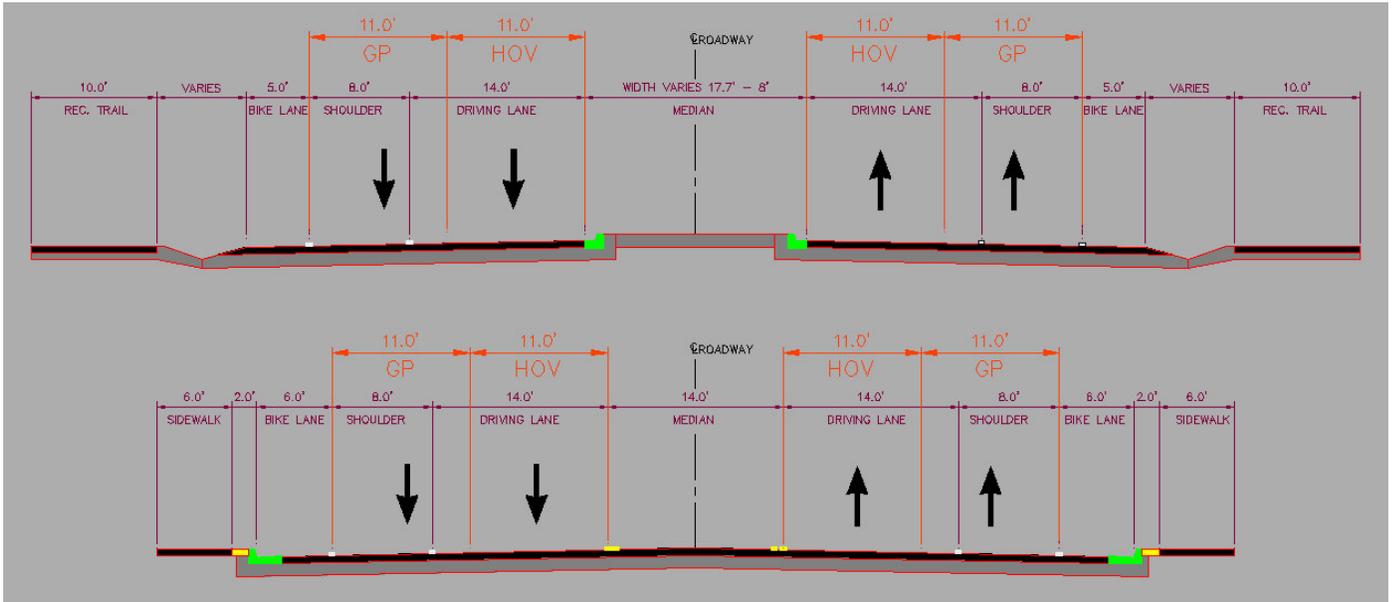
A – *Montañó Road Typical Roadway Section with 4 General Purpose Lanes
